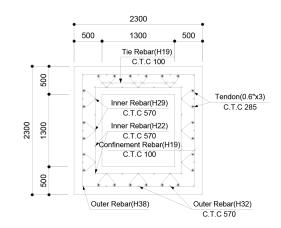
Equivalent section with strand and proposed section (Note: Units in mm).
